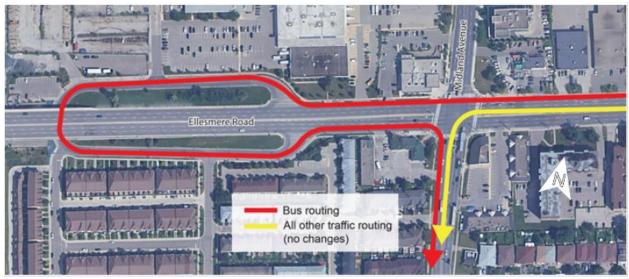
Existing "Michigan Left" at Ellesmere Road and Midland Avenue
